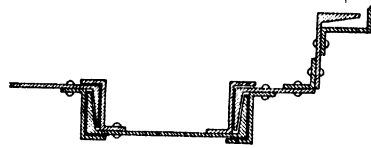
Friestedt interlocking channel-bar piling (Carnegie Steel Co.).
